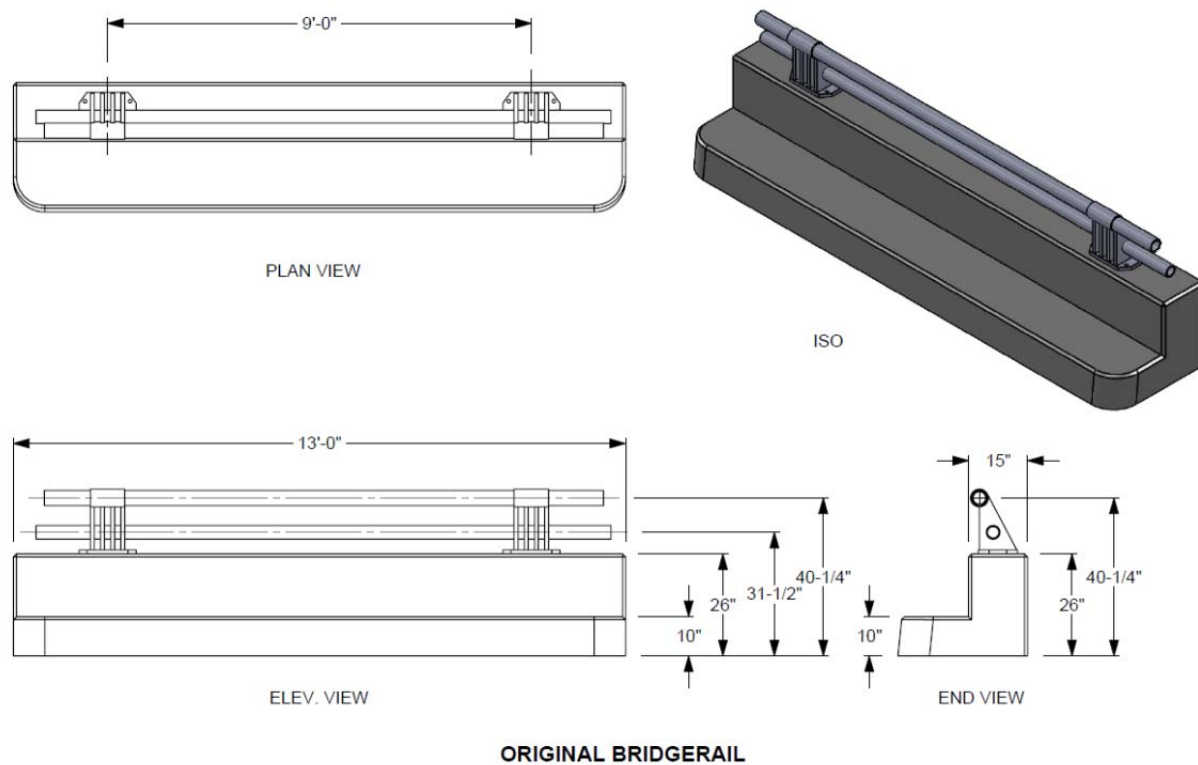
Details of Combination Concrete Rail with Aluminum Post and Rail
